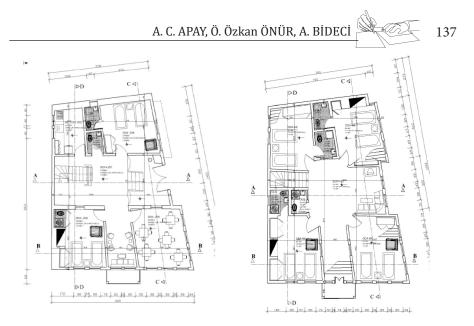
Çakırlar Mansion's ground floor plan and first floor plan
